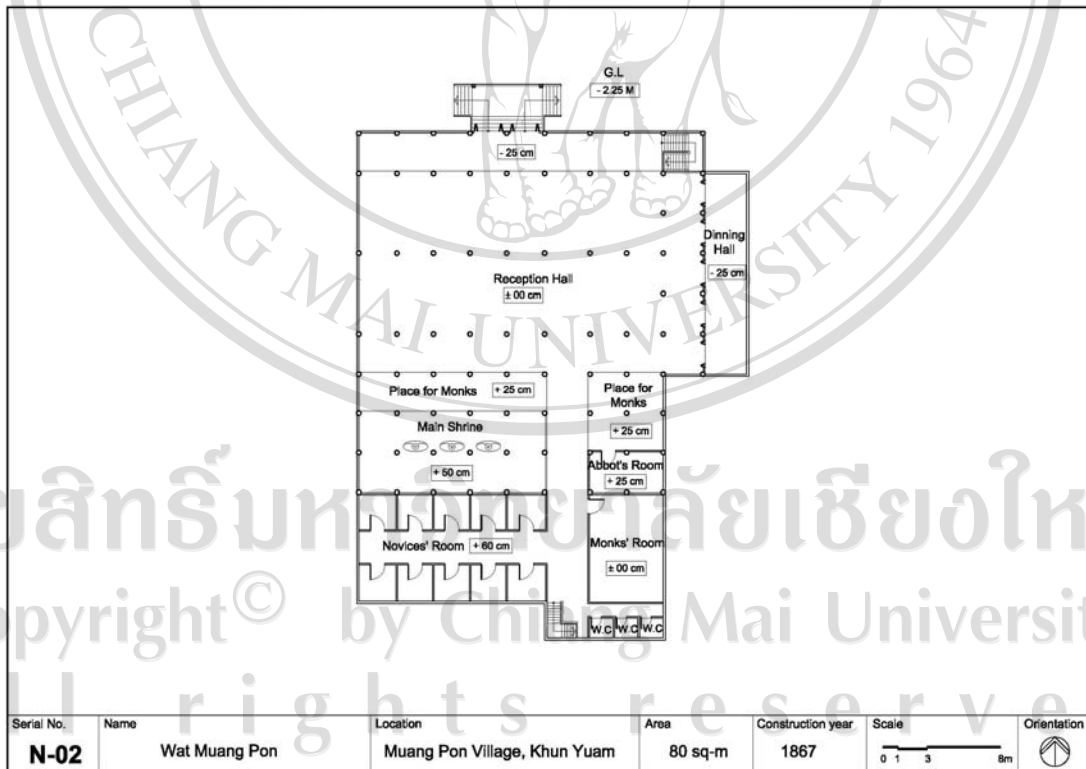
Plan of Wat Muang Pon, Muang Pon Village, Khun Yuam
